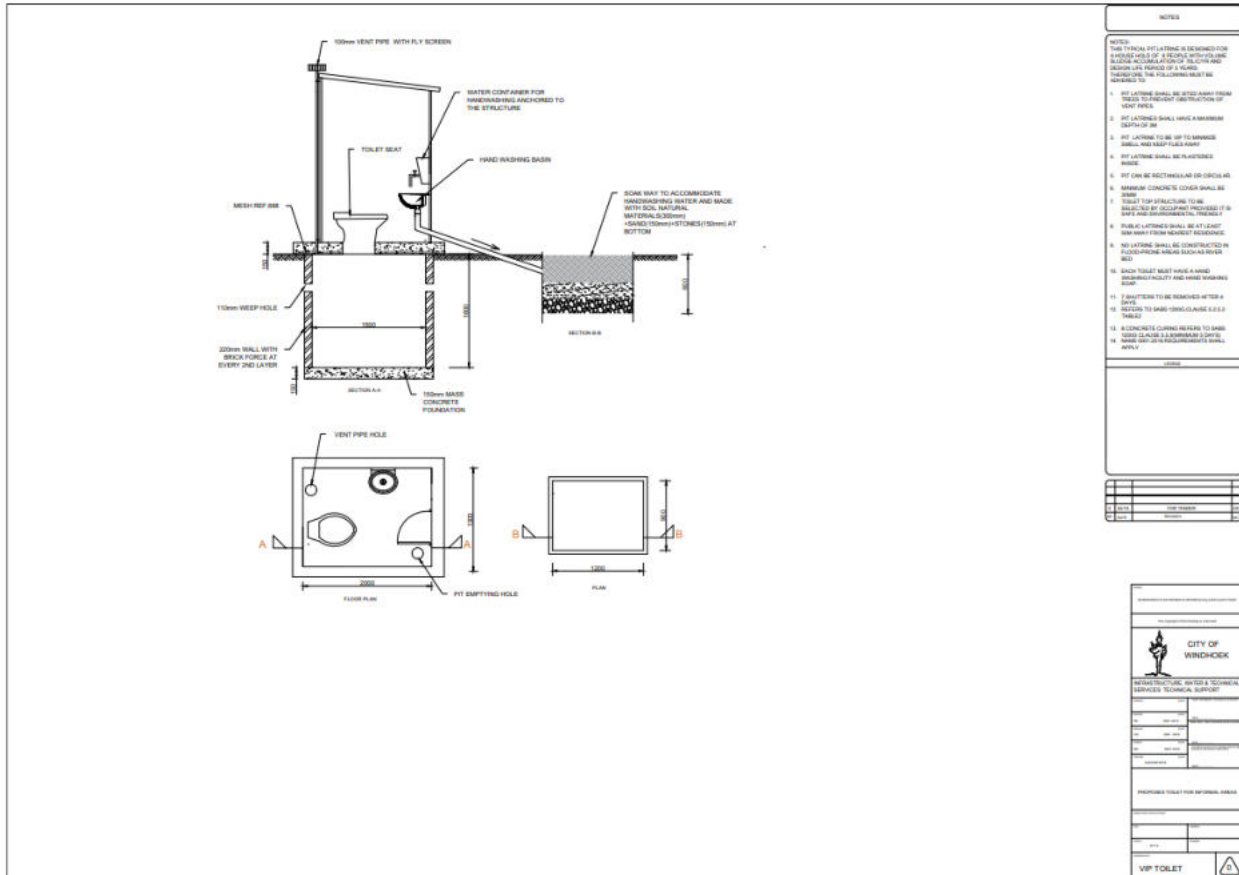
Dry toilet (pit latrine) layout by WMC - A
